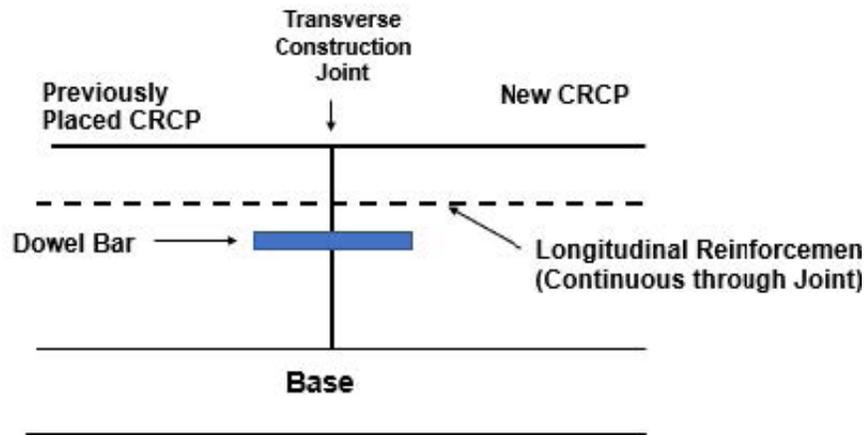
Diagram. Recommended CRCP transverse construction joint design.
